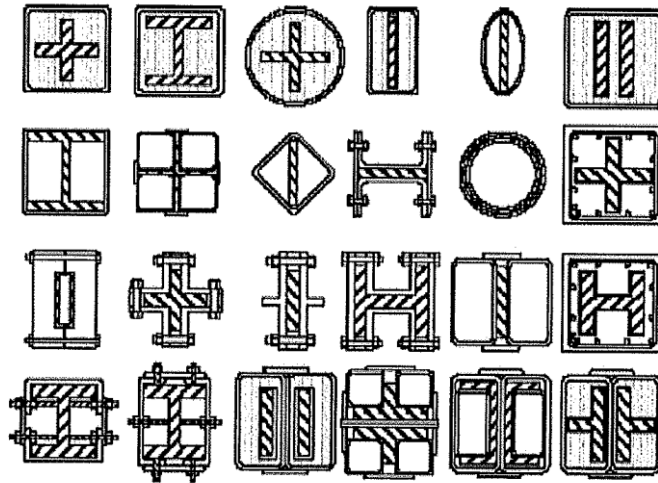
Common steel-concrete and steel-steel BRB cross-sections (Corte 2011)
